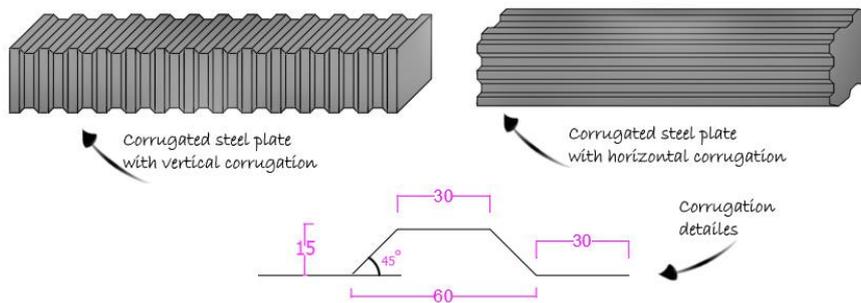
The details of vertical and horizontal corrugated steel plates (all units are in mm)
